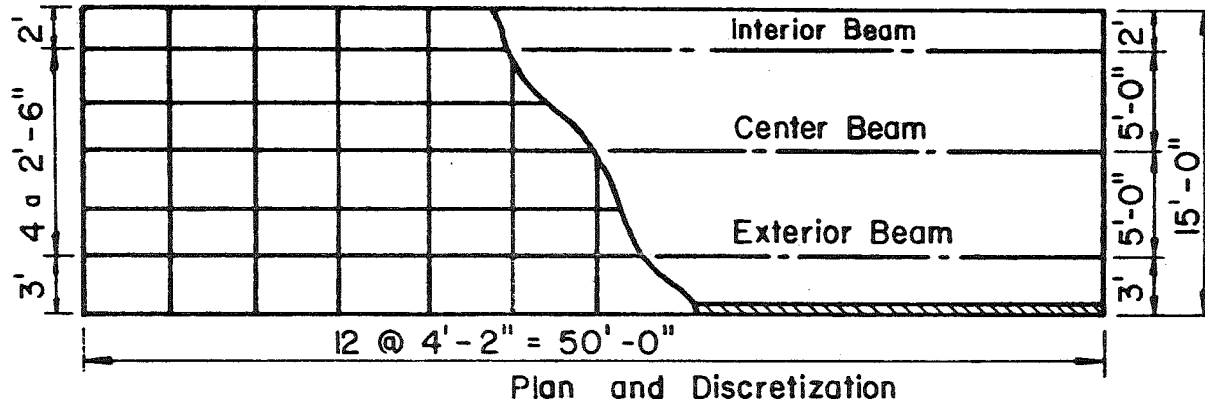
Static Load Test of Bridge 3 (Ref. 6)
